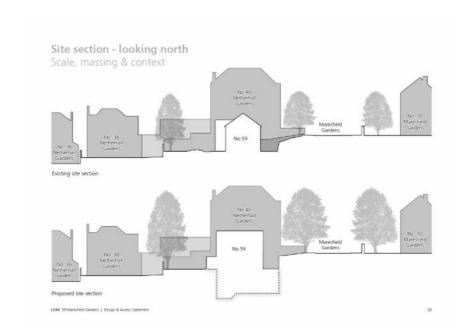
Existing and proposed site sections. NTS. Source: LOM Architecture and Design (2015).
